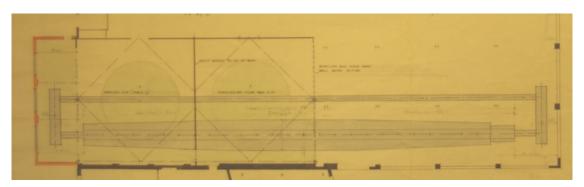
The 1947 to 1950 tunnel kiln in Building G
